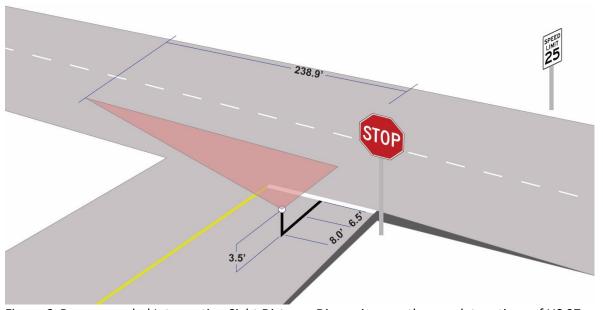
Recommended Intersection Sight Distance Dimensions on the couplet sections of US 97.
